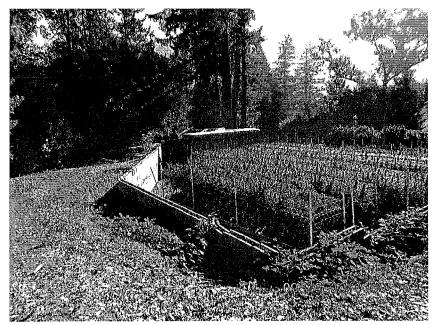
Dug in cultivation area with concrete footings and retaining wall
